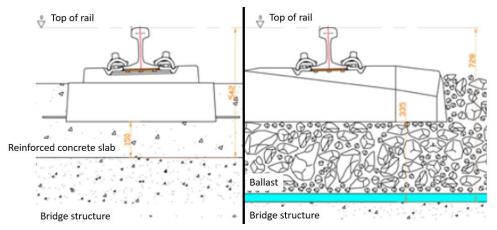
Rail bridge / Supported system (ballast or concrete slabs for railways)
